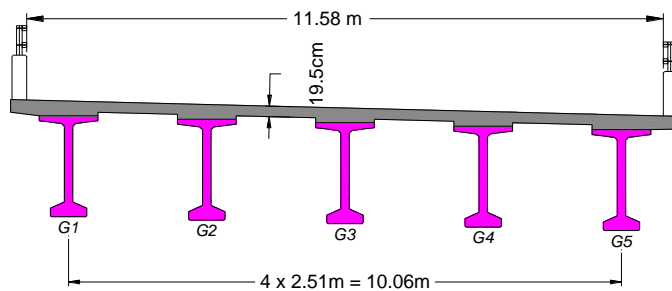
a shows Bent 24 of the monitored segment of Bridge #2. It supports a clear roadway width of 11.58 meters [38 feet] on five prestressed BT-72 girders, spaced at 2.51 meters [8'-3"]. The 19.5-cm [7.5-inch] reinforced concrete deck was monolithically cast with the continuity diaphragm joining adjacent girders over intermediate bents. The cross-sectional dimensions of the segment are shown in Fig. 2-4-b. Positive moment reinforcement in the form of five #5 hairpin bars (see Fig. 2-4-c) extending out of the bottom flange was chosen by the designer. It should be noted that the girders are supported by rubber bearing pads over a typical pile bent supported on 61-cm [24-inch] square prestressed concrete piles.
